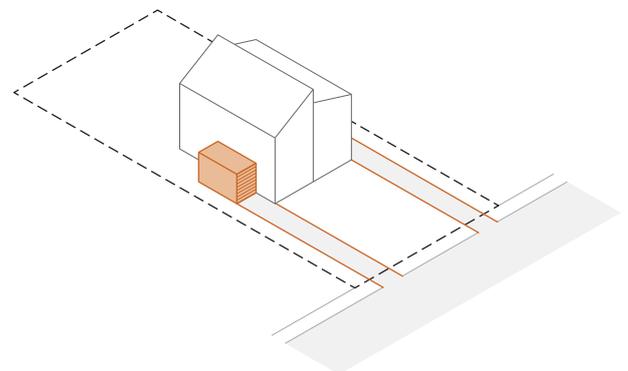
Setting garages behind the building frontage create a better public realm interface.
